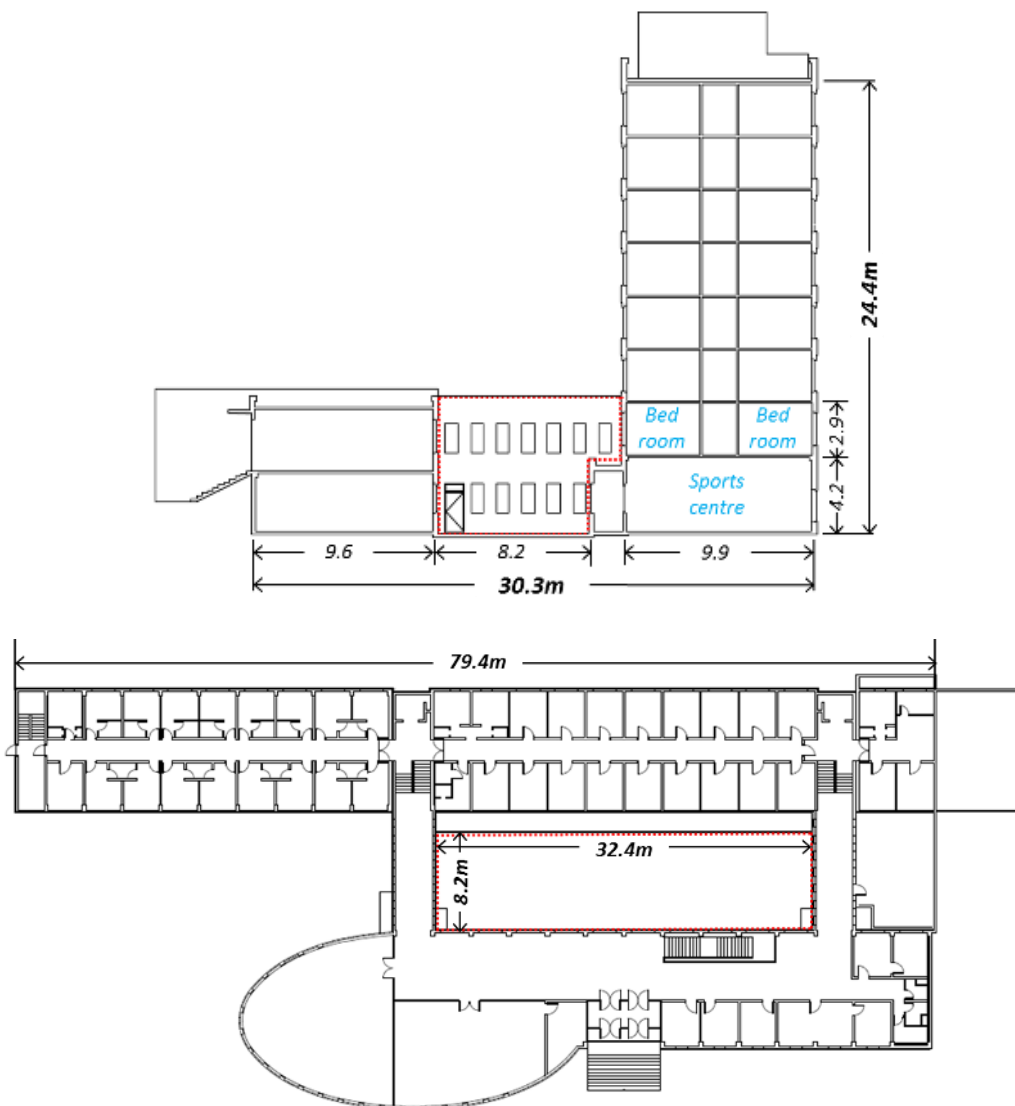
Cross section (top) and ground plan (bottom) for the accommodation building (*Unit: m*)
